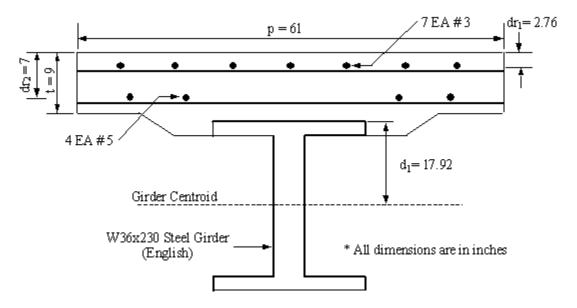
Geometry and reinforcement arrangement of the deck section supported on steel girders
